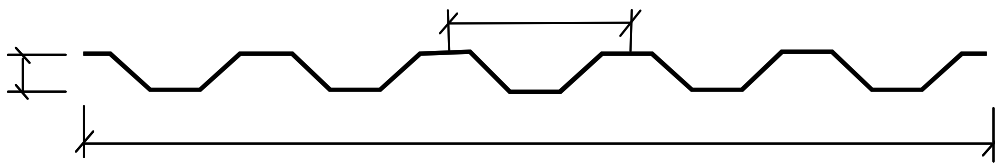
Metal Deck Profile for Wall and Roof Systems
